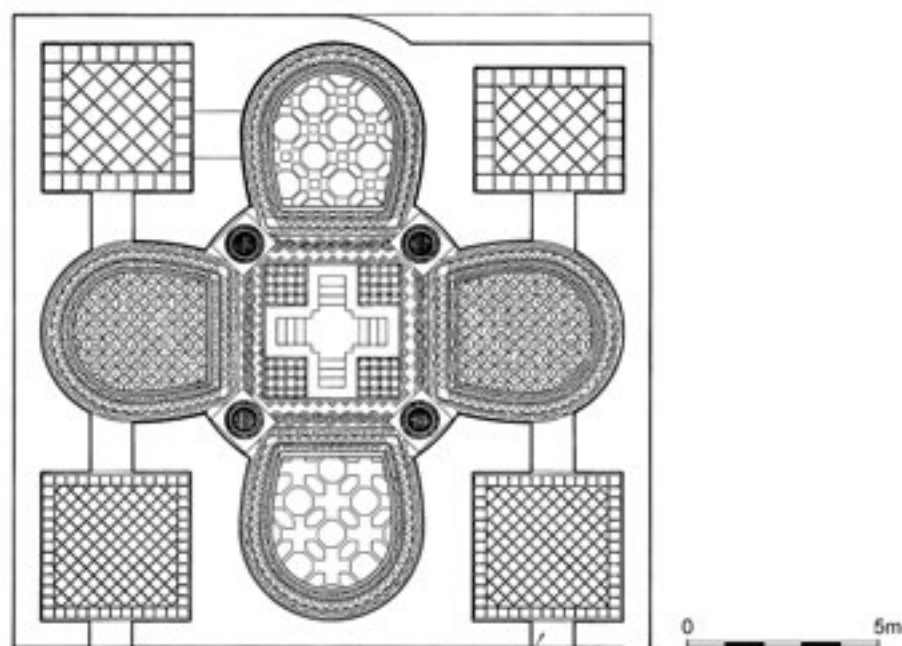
Caričin Grad; ground plan of baptistery, reconstruction
